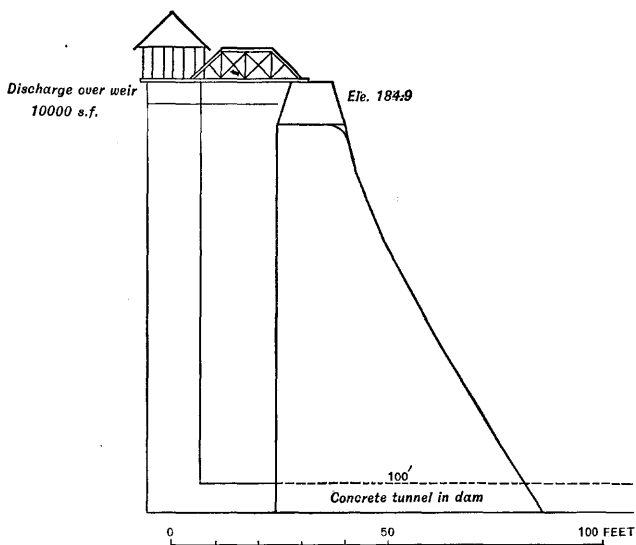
Cross section of concrete overflow dam, Briscoe reservoir.
